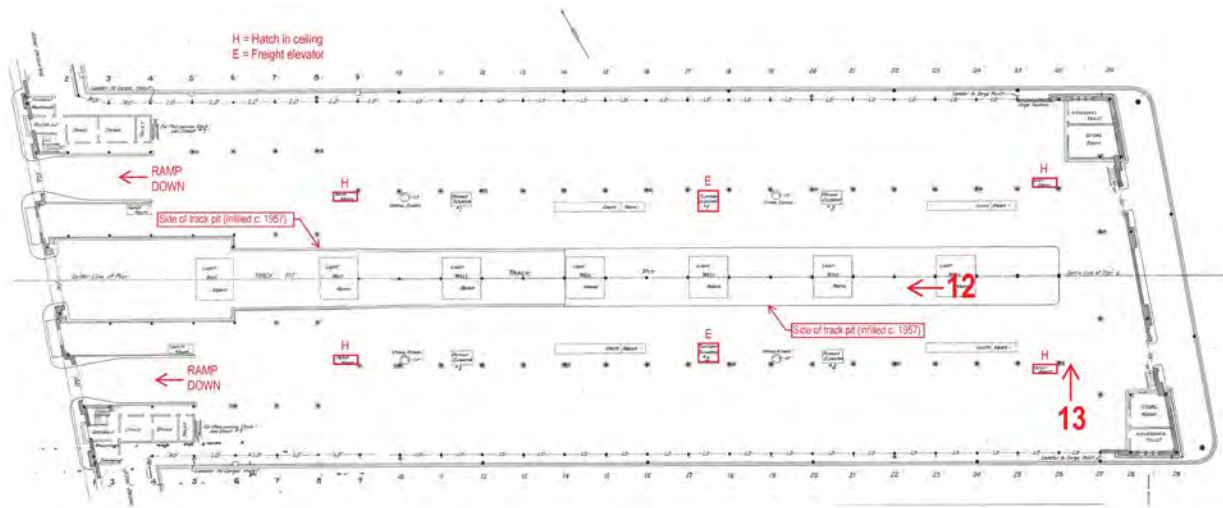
Pier 38 – Plan of first floor with photo key. This plan is taken from the original set of construction drawings and, with the exception of some missing equipment as noted, accurately represents the existing conditions. The remaining elevators and hatches are noted.
